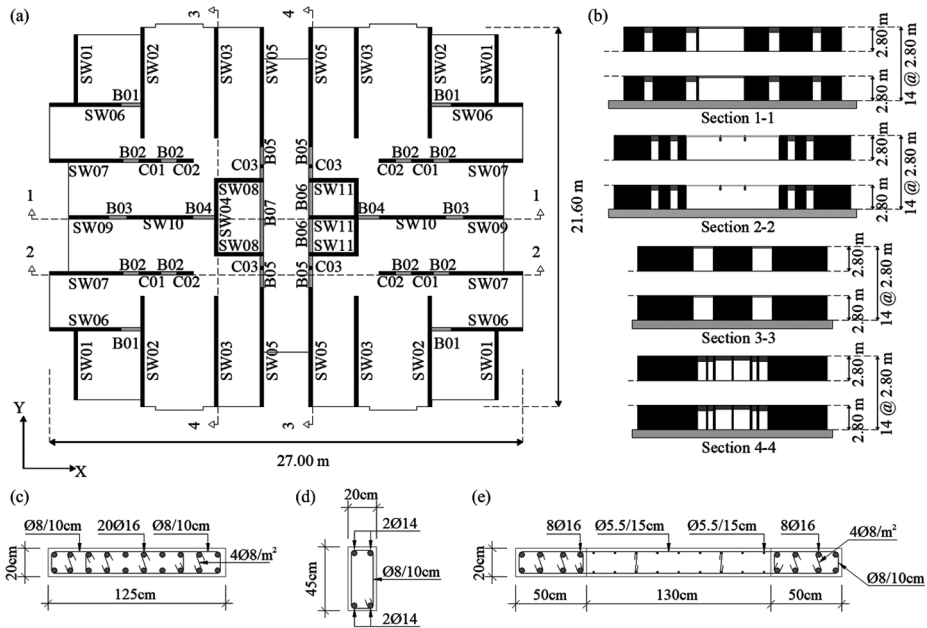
(a) plan view of the case study tunnel-form building and nomenclature used for the structural members; (b) elevation view of the sections [units in m]; cross-sectional details of (c) column C01; (d) beam B01; (e) shear wall SW09
